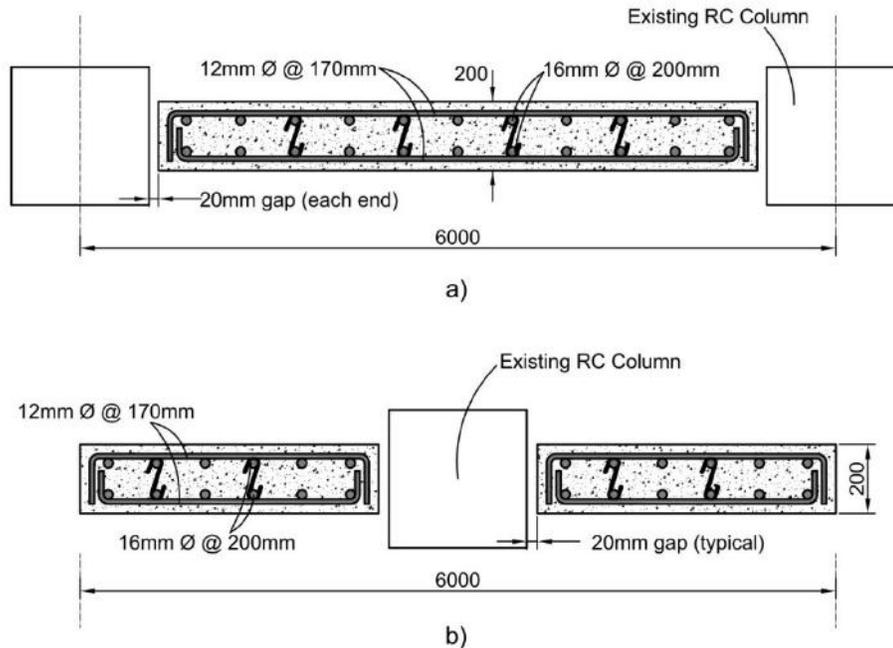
Typical RC shear wall geometry and reinforcement (RS3): a) a 6 m long wall between two adjacent columns and b) a 3 m long wall at each side of the column.
